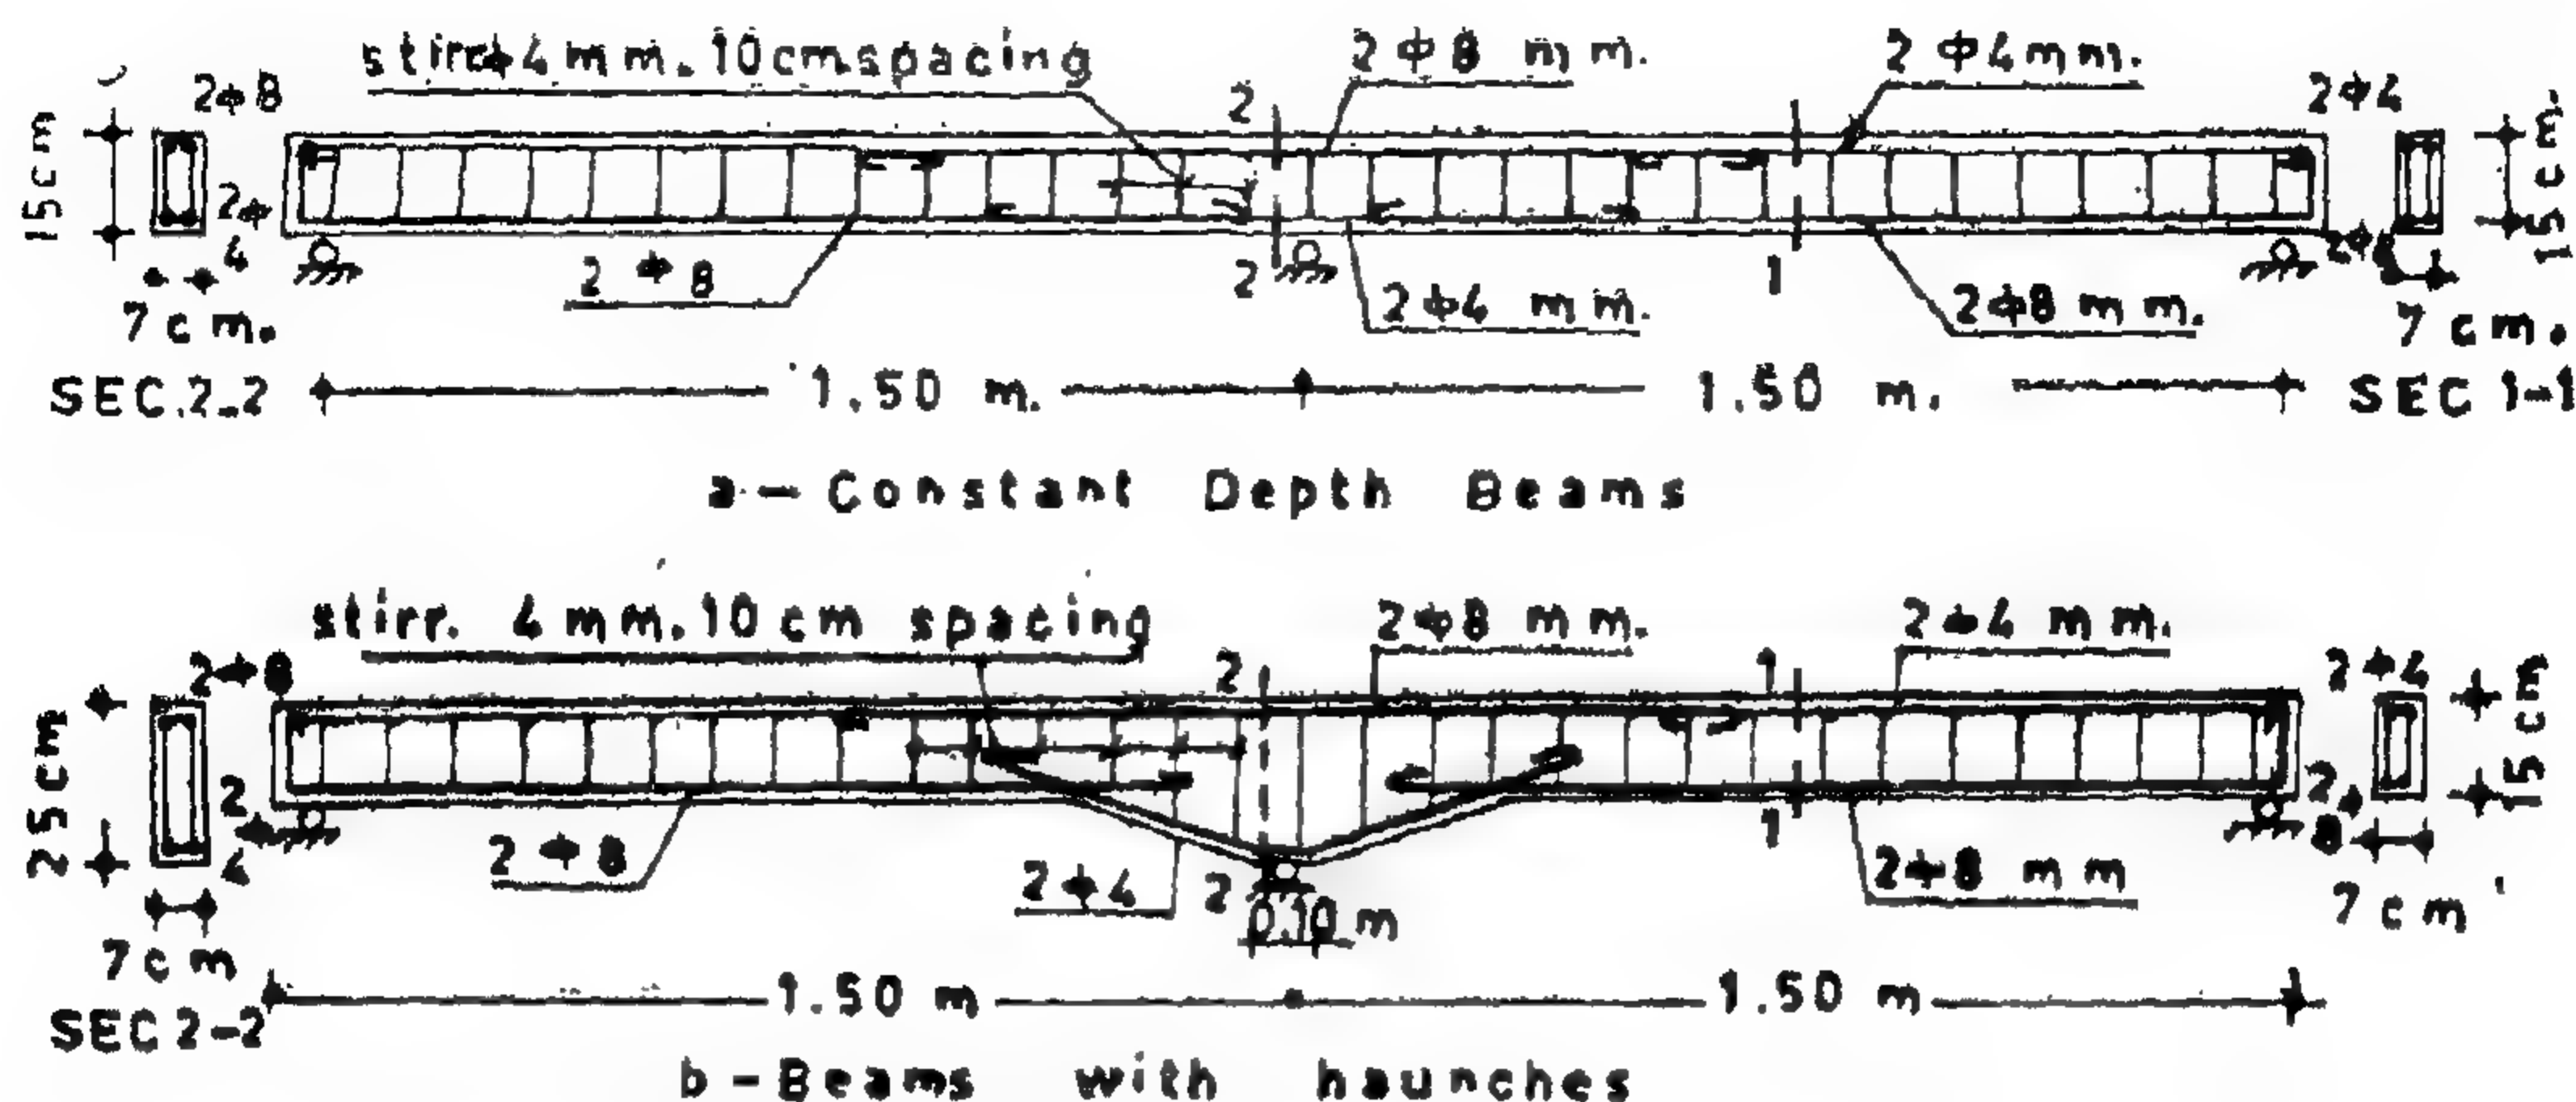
BEAMS REINFORCEMENT DETAILS.
